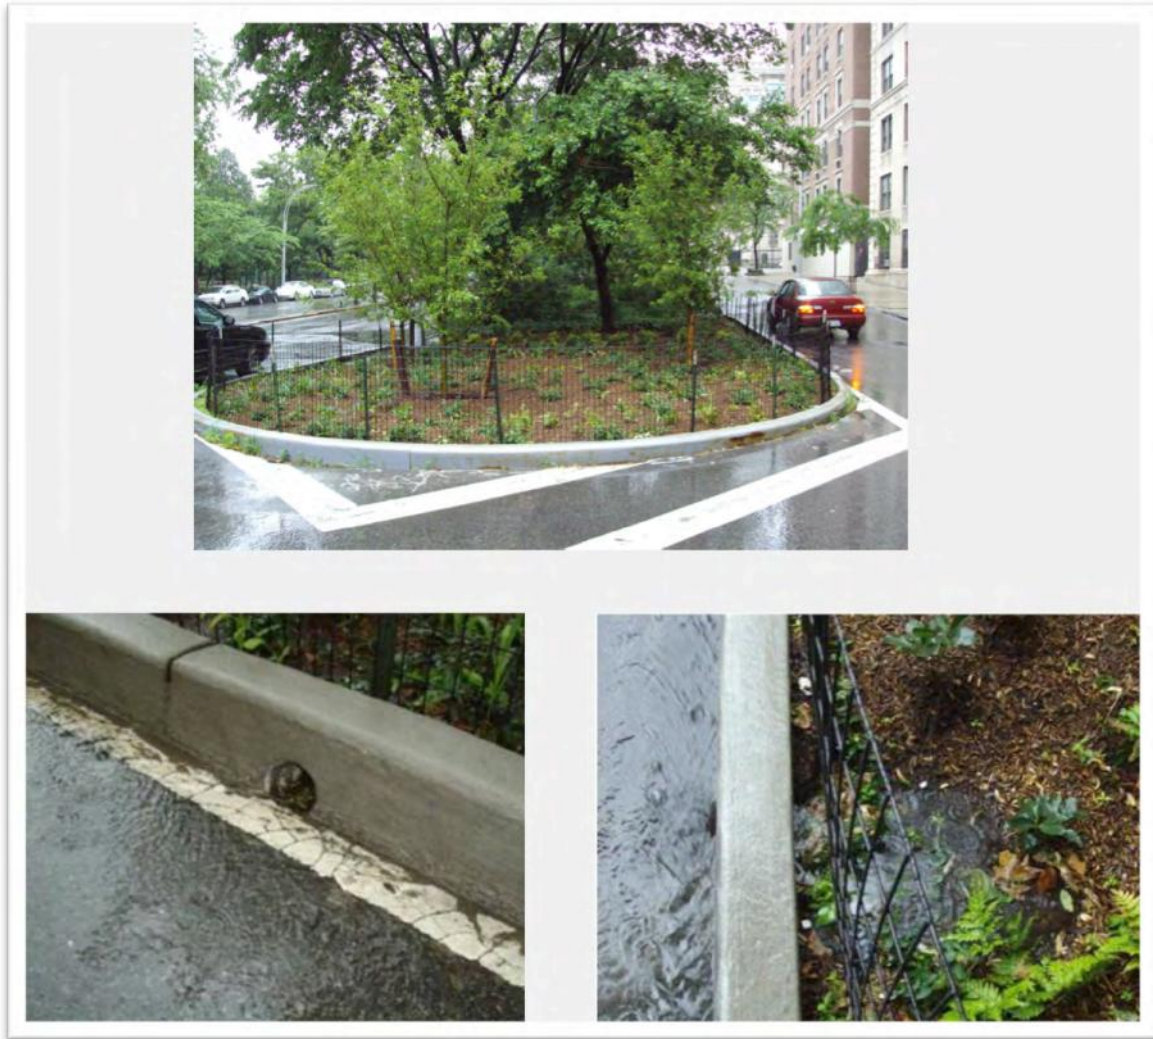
Greenstreet at Riverside Drive and 104th Street (top) and pipe inlets (bottom) that direct water into the bioretention area. Photo credit: Nandan Shetty with NYC Parks and Recreation Department. See Figure 3 for site plan.
